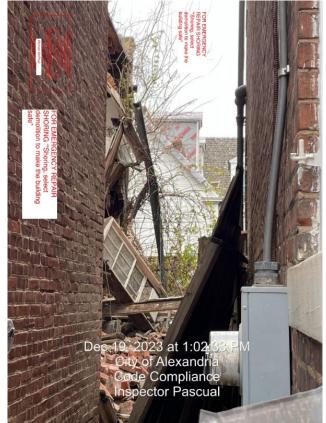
Ell east elevation post collapse; main block in foreground on left.
